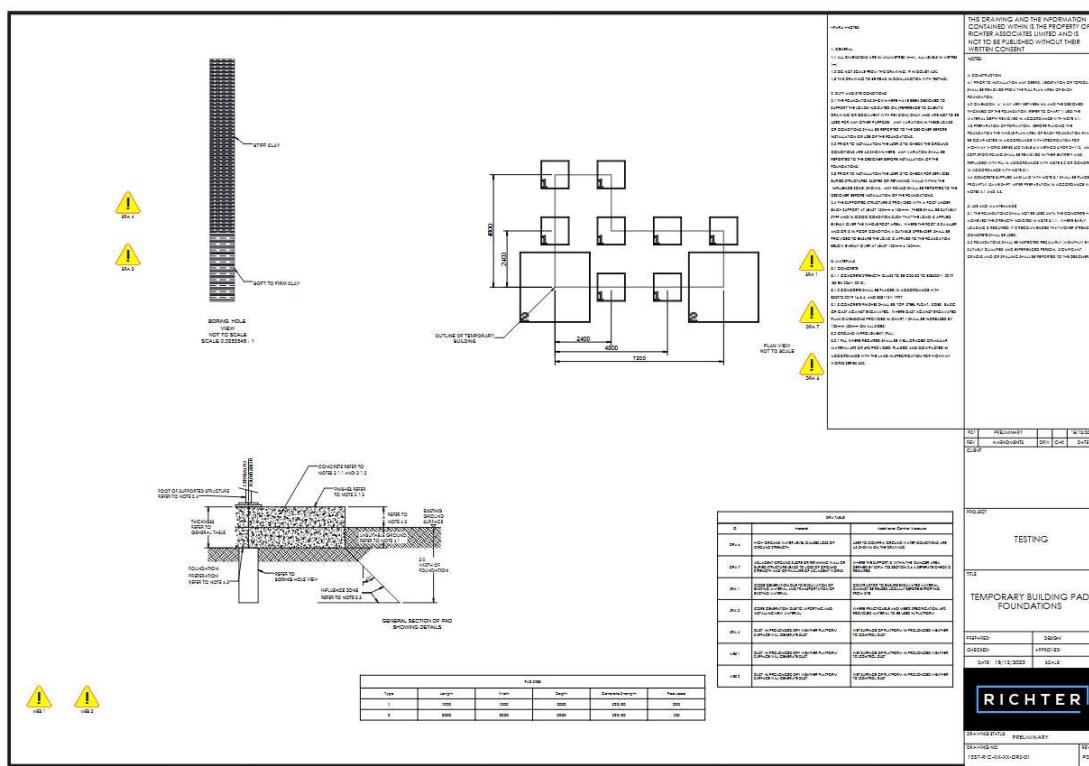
Testing generated drawing for office pad foundations with custom plan view
